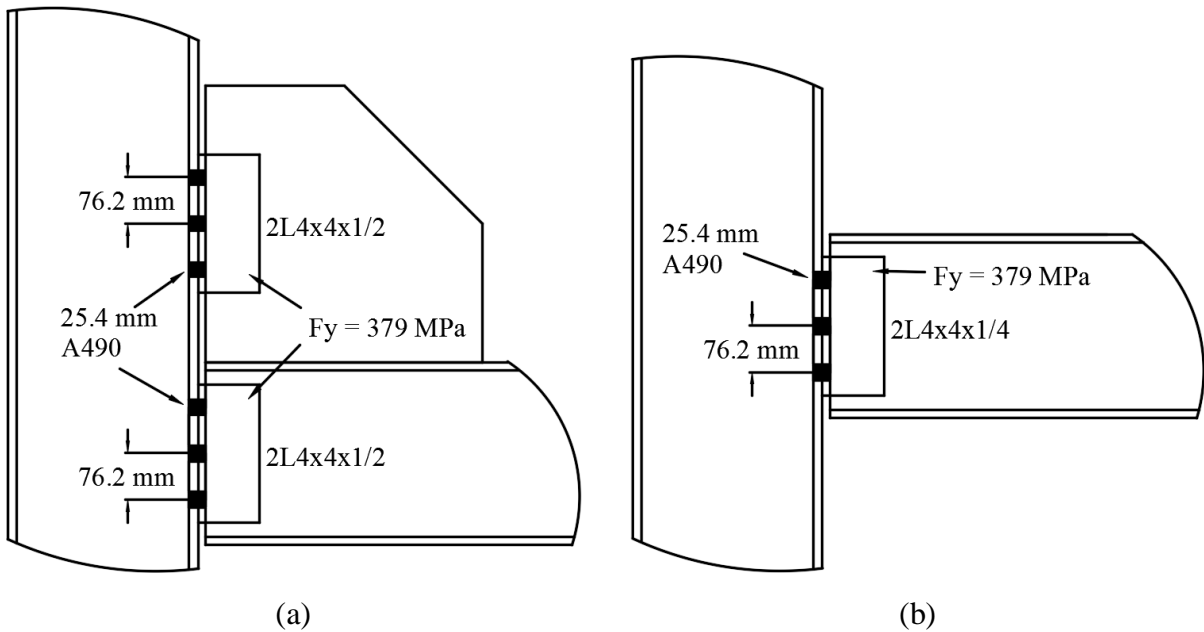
Typical connections used in prototype building model: (a) CBF connection; and (b) Gravity connection.
